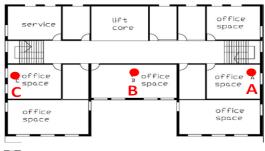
Floor plan of the office building with the measurement points (A, B, C) during the survey
